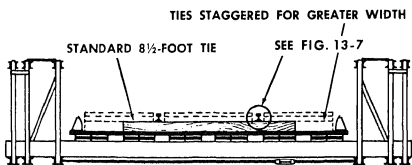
Decking of through-type panel railway bridge, using standard 8 1/2-foot ties.
